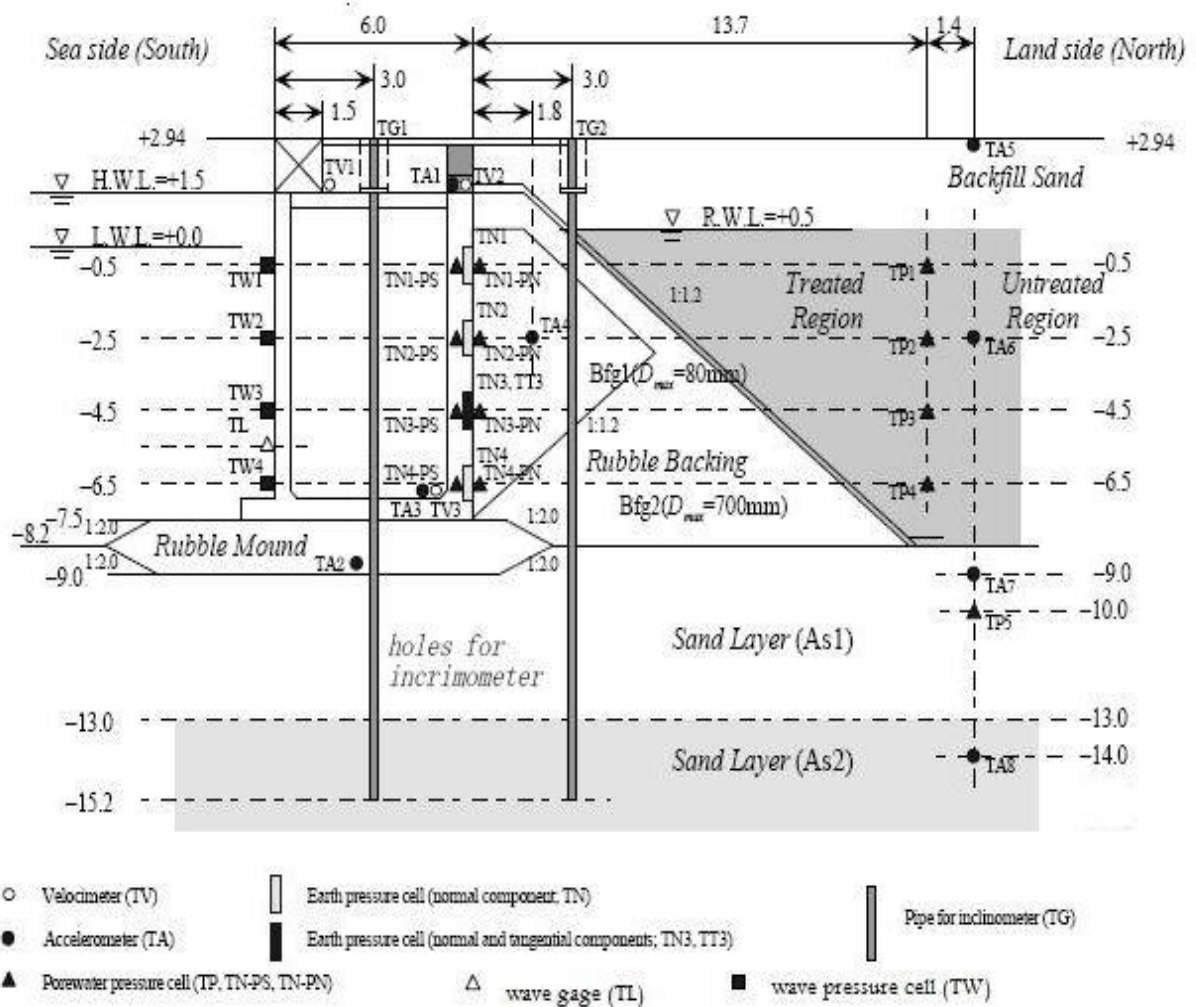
Cross-section of caisson quaywall (treated backfill) with instrumentations
